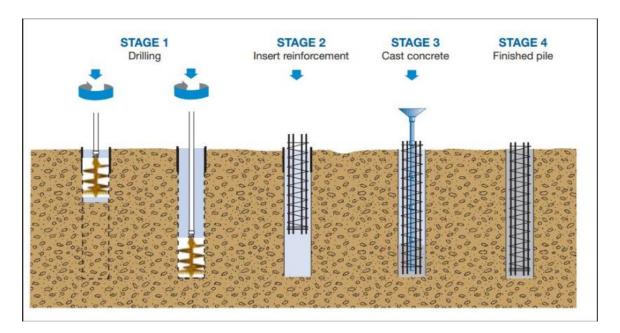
Example of bored cast in place reinforced concrete piles (note that temporary casings which may be used to prevent bore hole from collapsing is not shown)<sup>5</sup>.
